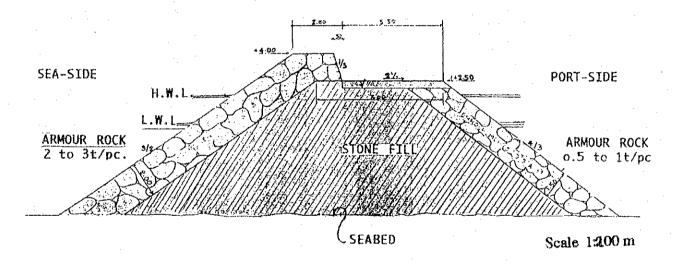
(1)-12 Original design section of North Breakwater
